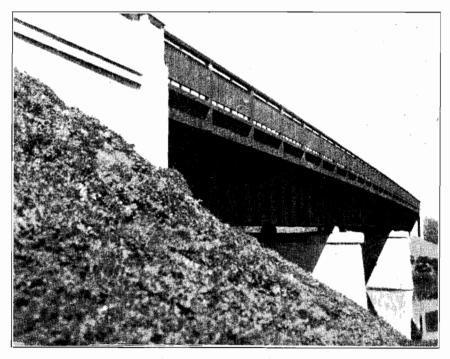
Showing the new bridge over the Ovens River at Wangaratta.
